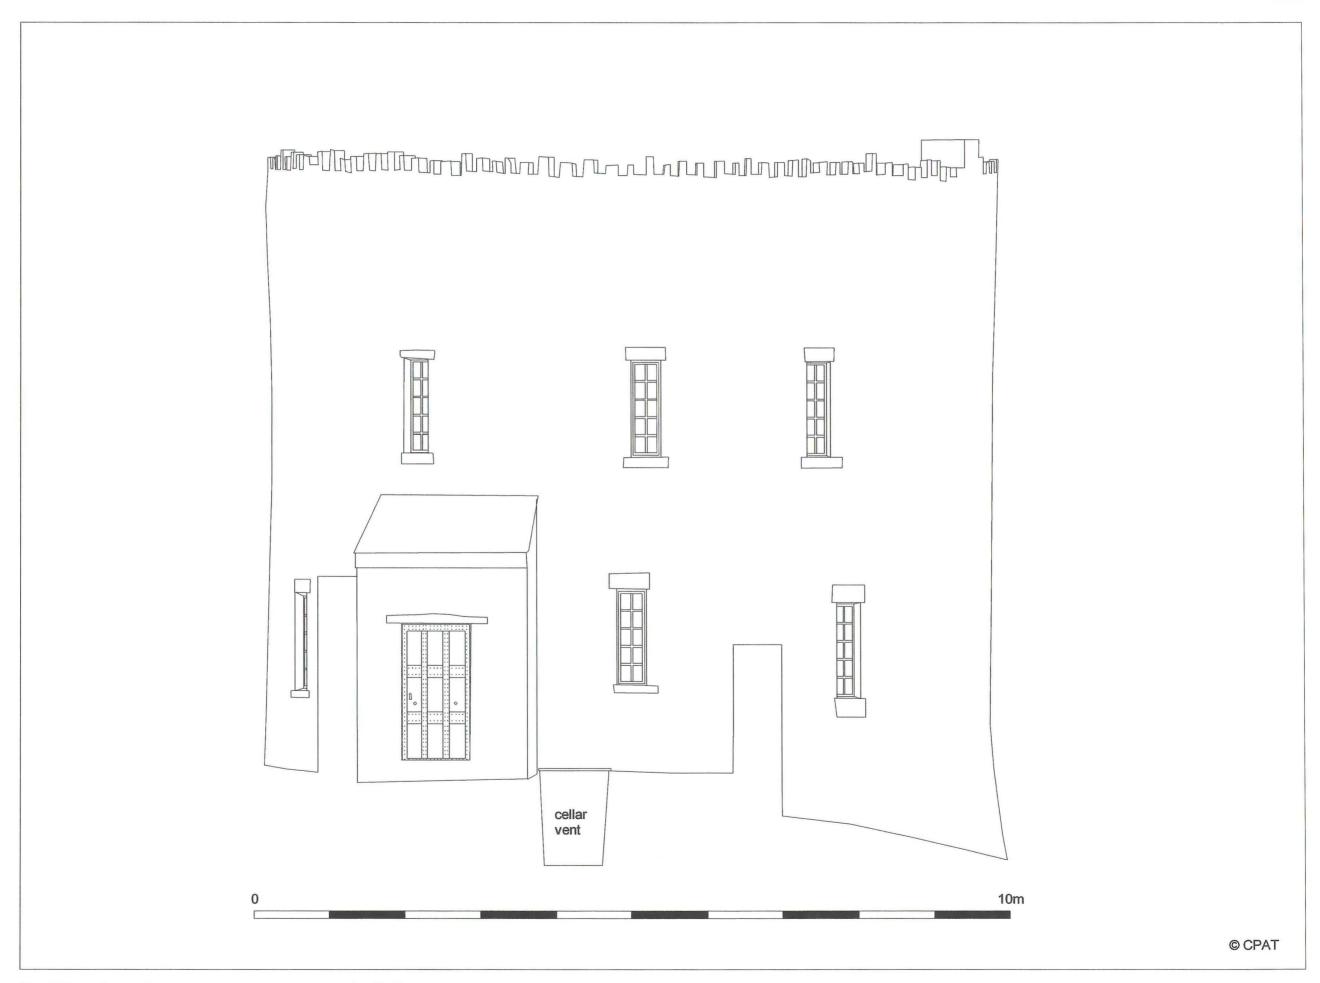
Roundhouse Farm north-east tower, west elevation (A-A)
